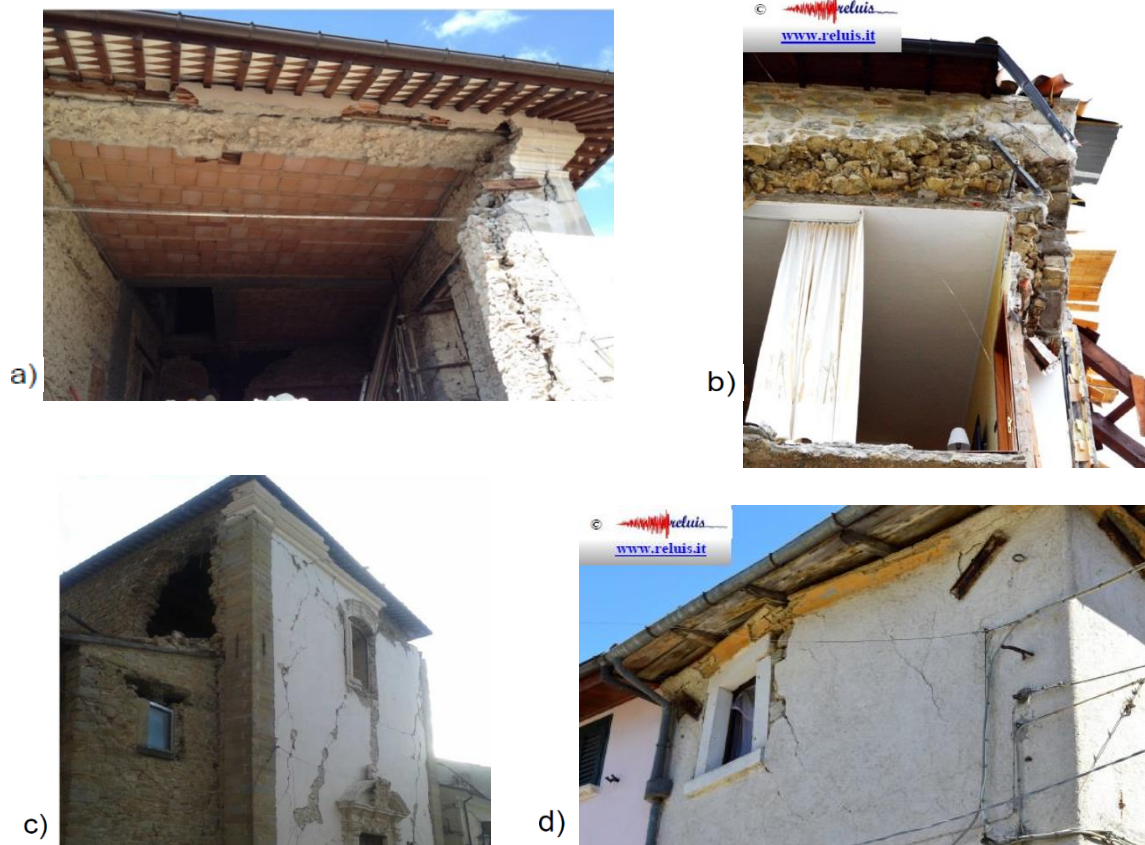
Failure of masonry buildings with tie rods. a), c) and d) Amatrice and b) Arquata del Tronto
